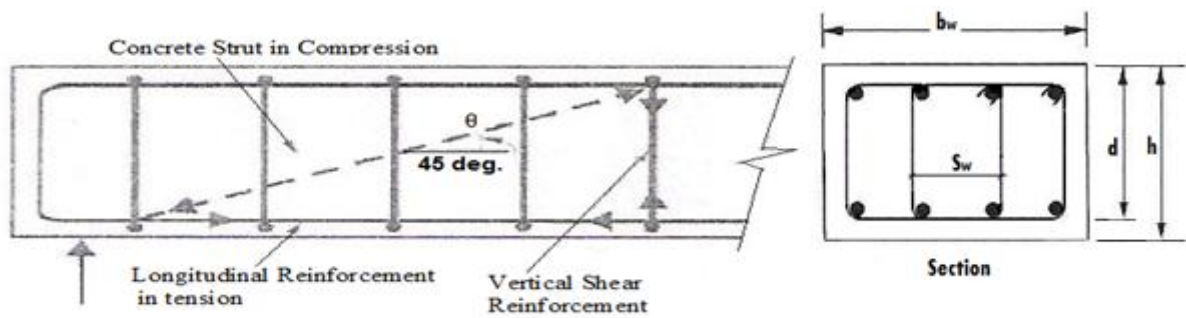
Longitudinal and Shear Reinforcements in a Beam to ACI318 and SBC304 Codes.
